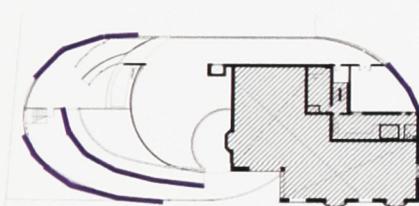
Diagram indicating location of the un-fixed stone printed fabric walls
